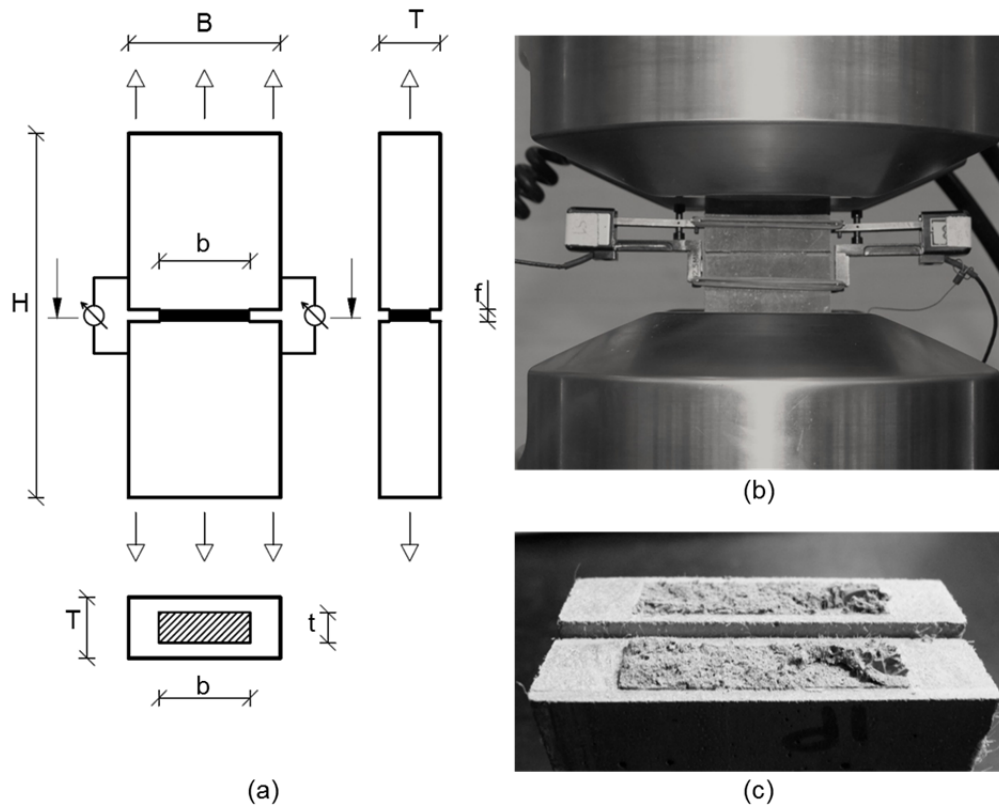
Single crack notched coupon test of ECC and PP-FRC: (a) specimen geometry; (b) test setup; (c) specimen after testing
